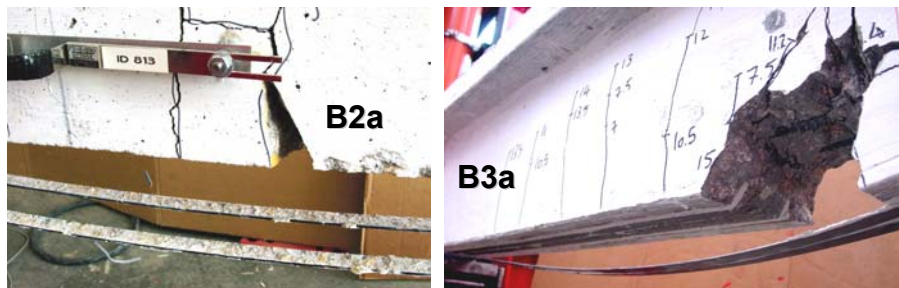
Debonding failure of beams strengthened with EB CFRP strips type 1 and type 2
